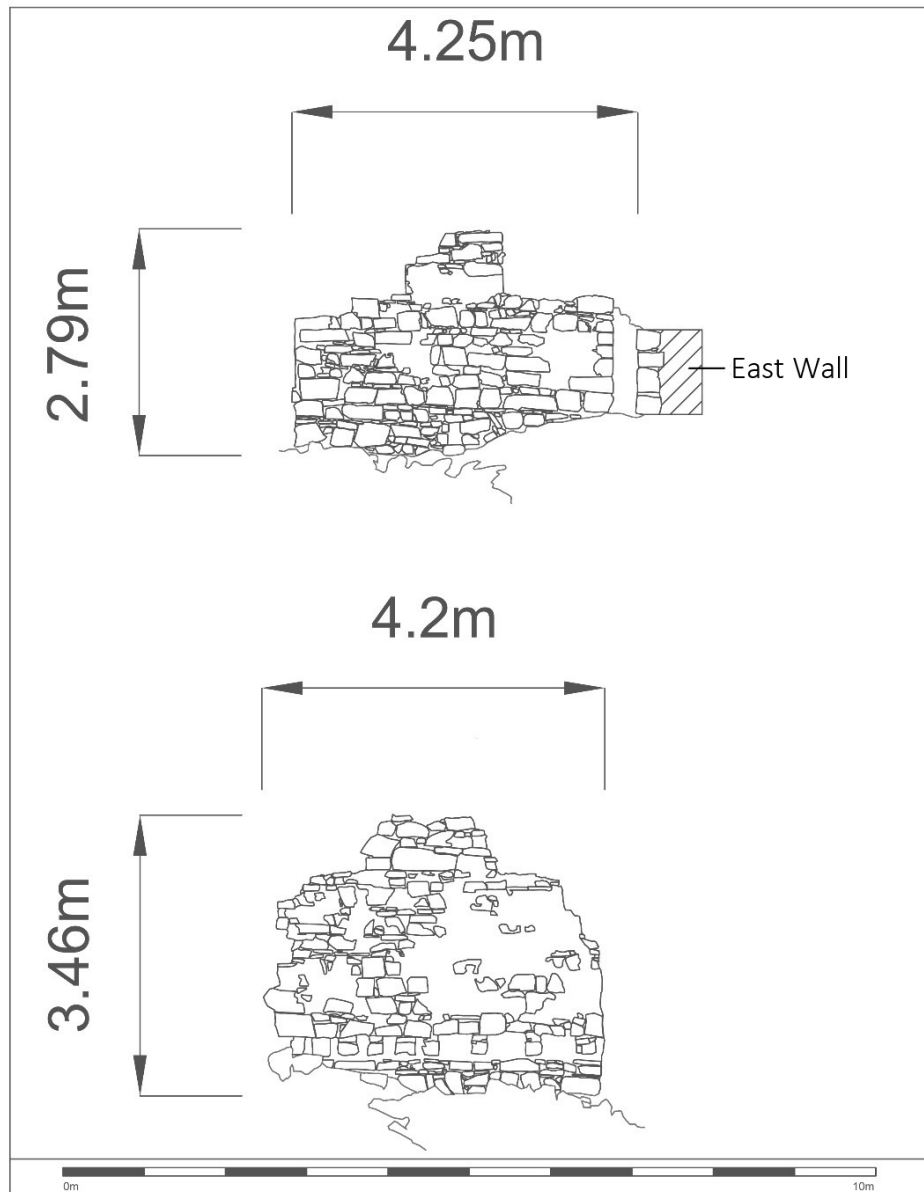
Internal elevations of the north (top) and west (bottom) walls of the collapsed signal tower at Cleggan Hill Signal Station.
